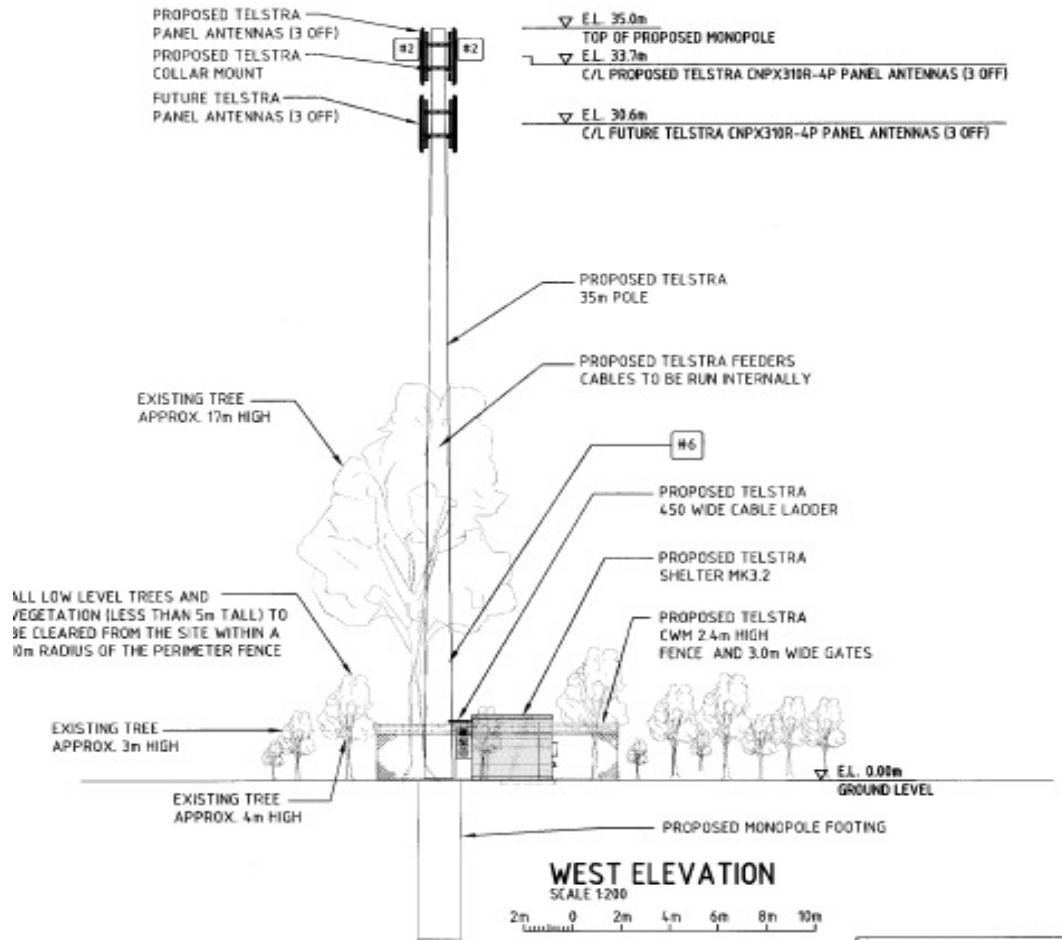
western elevation of the proposed development (extract-Urbis SoEE)
